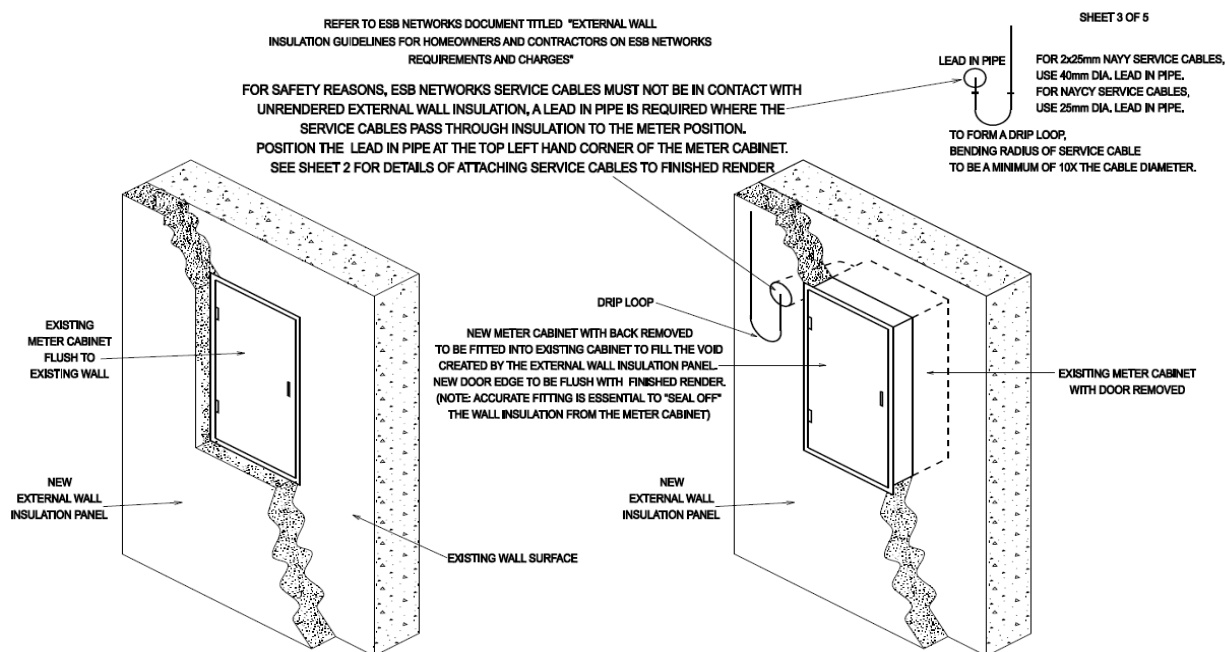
External wall Insulation fixing of service cable to extension of existing meter cabinet detail
